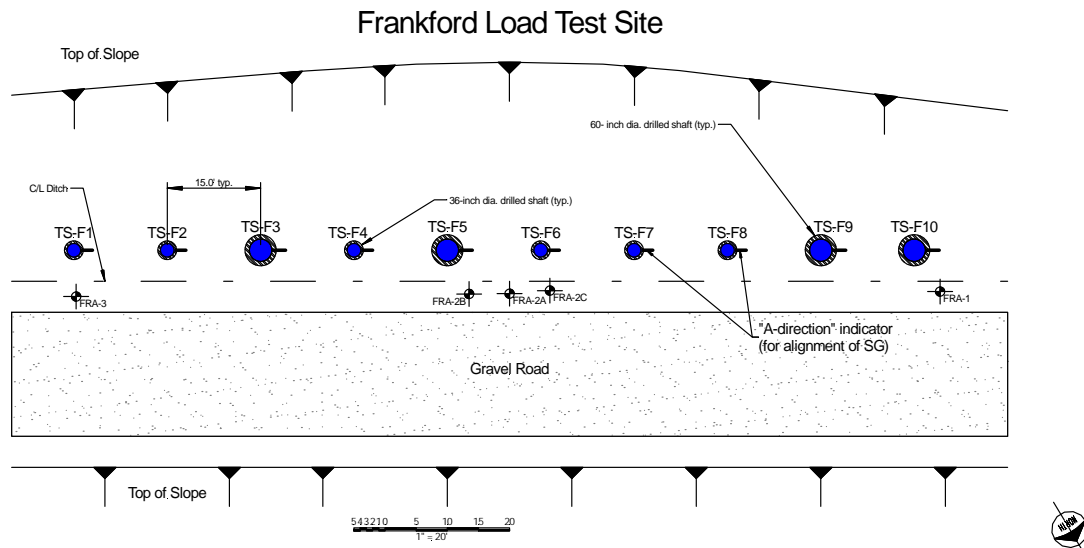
Plan view of Frankford Load Test Site showing locations of the test shafts and boring locations. U.S. Highway 61 is located on the north side of the gravel road, at the bottom of the schematic.
